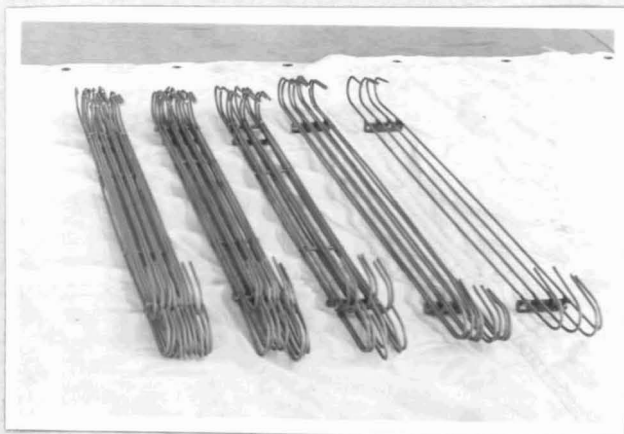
Assembly of 1/4" ϕ Deformed Bars
